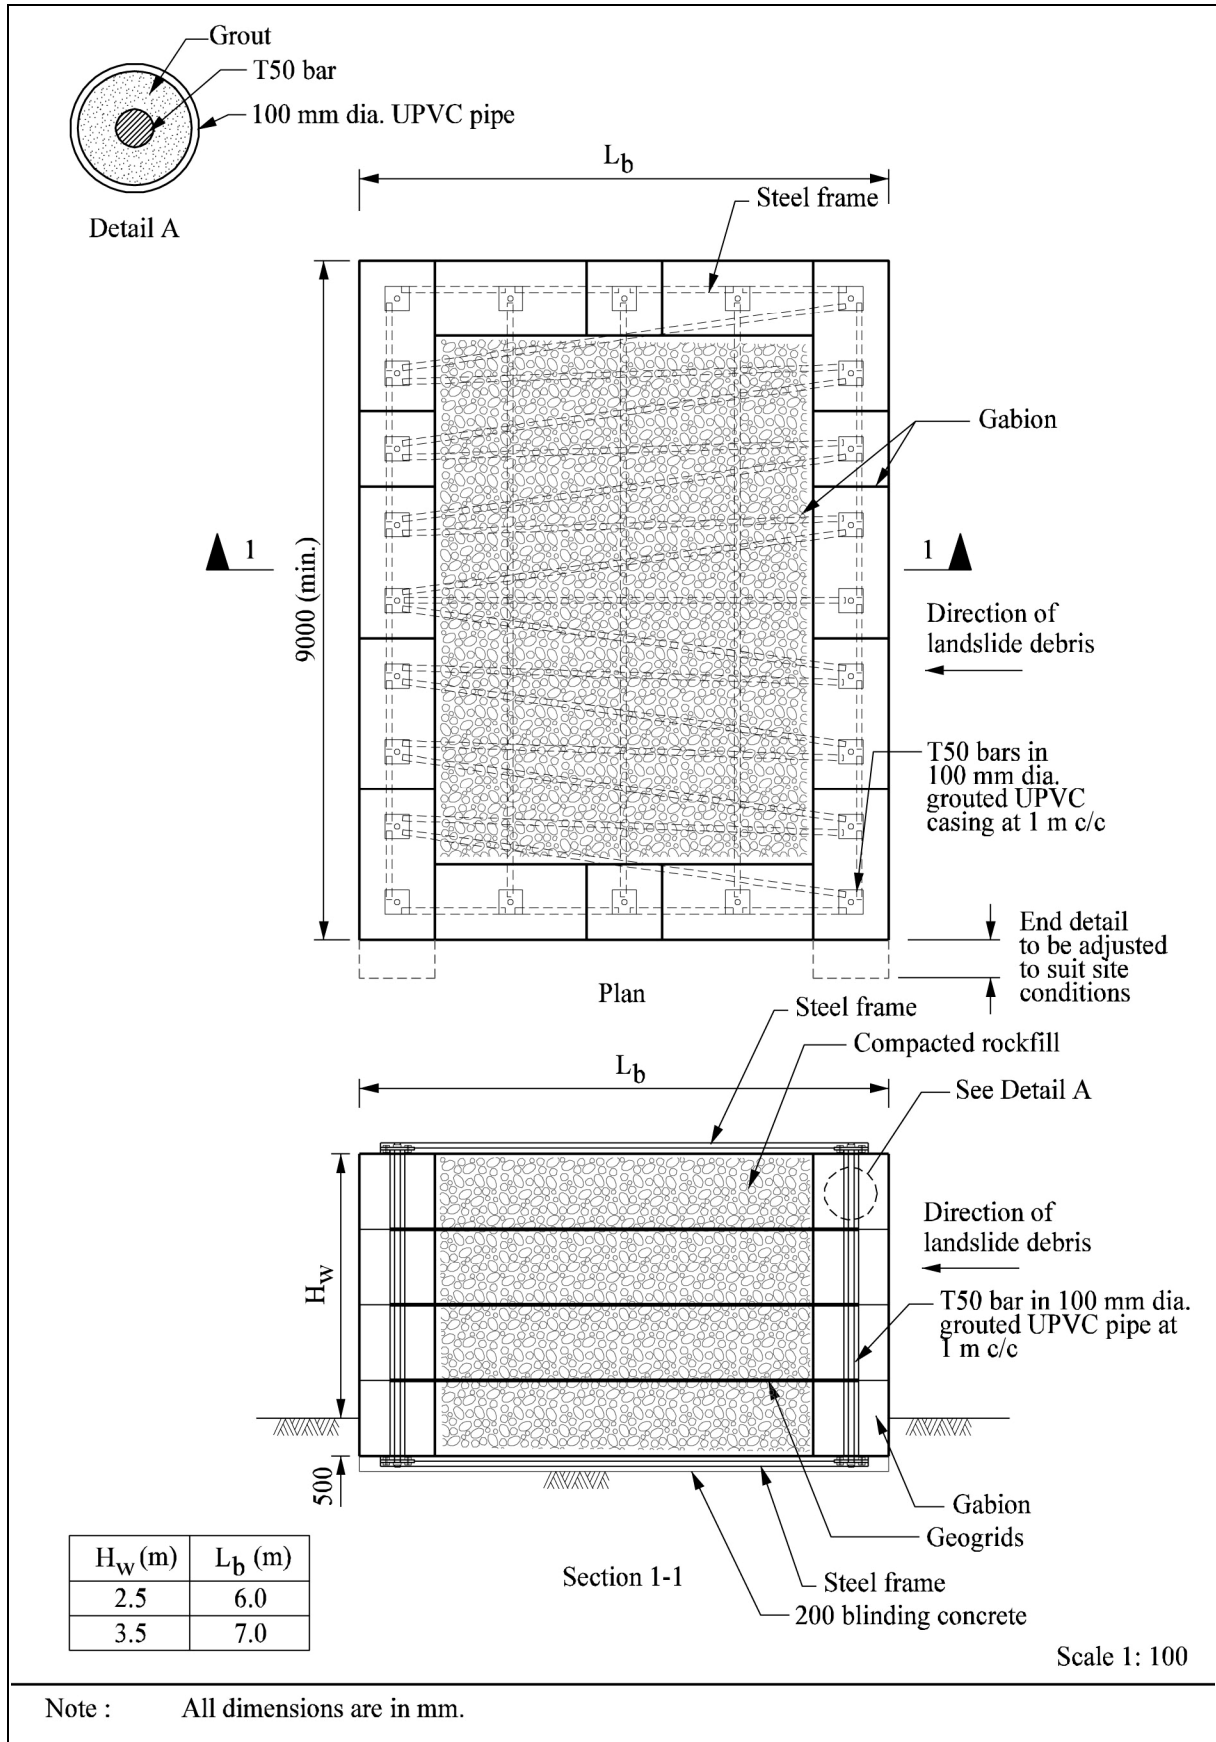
Reinforced Gabion/Rockfill Barrier (Type 3B Barrier)
